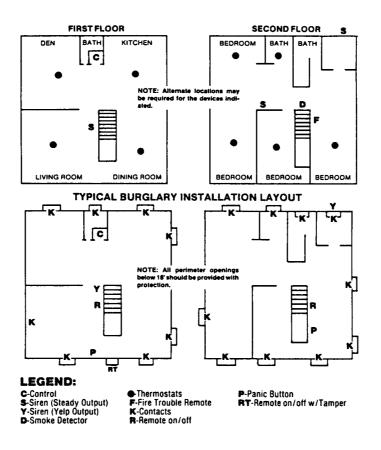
TYPICAL INSTALLATION LAYOUT
